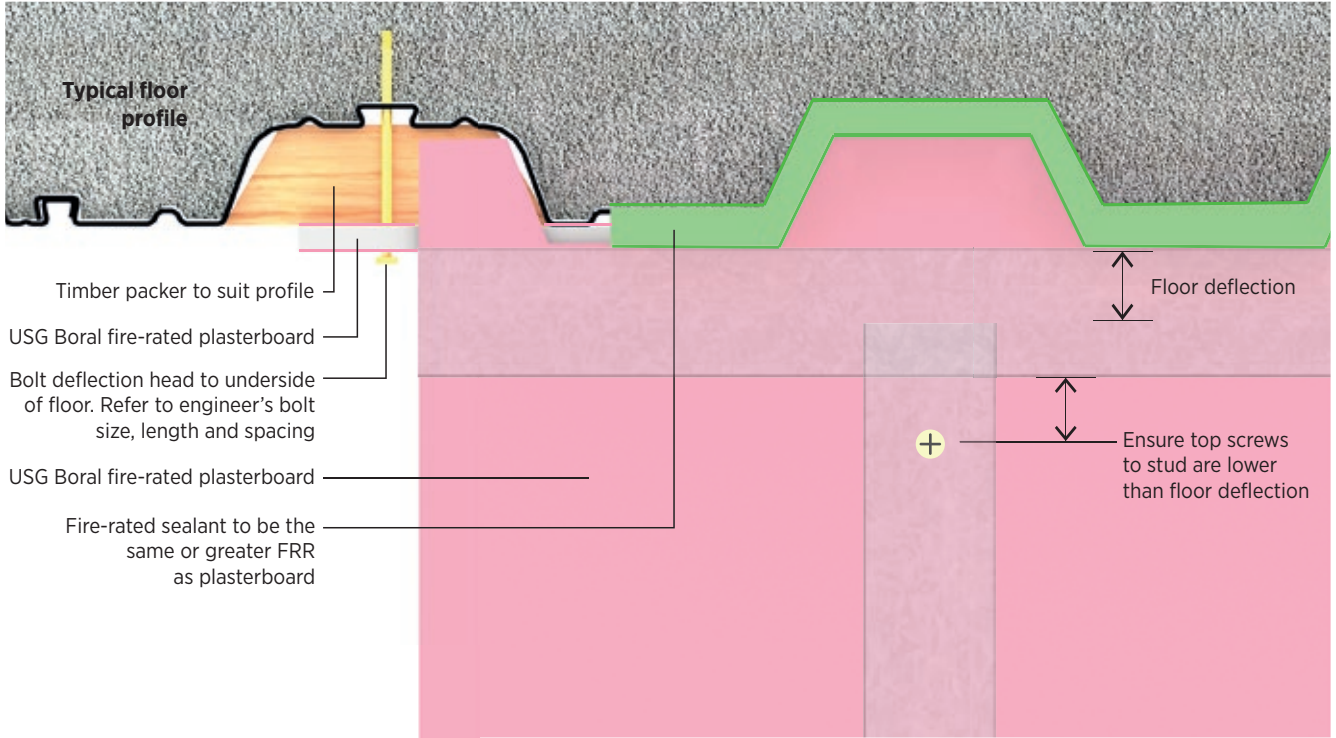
Steel Stud Wall Perpendicular to Rib Profile
